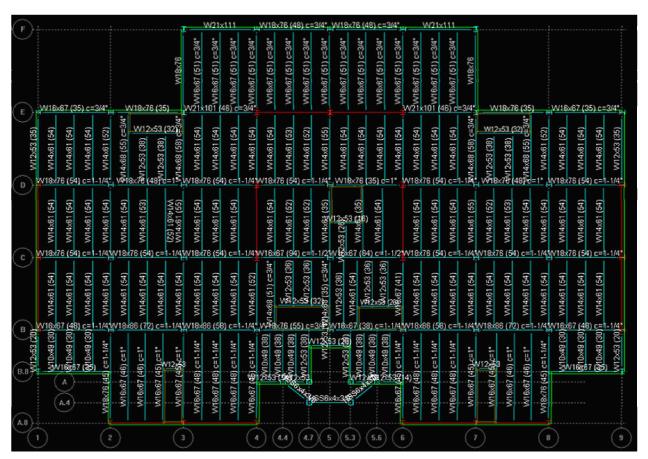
2nd Floor Plan of Proposed Structure with 4-span In-fill Beam Layout
